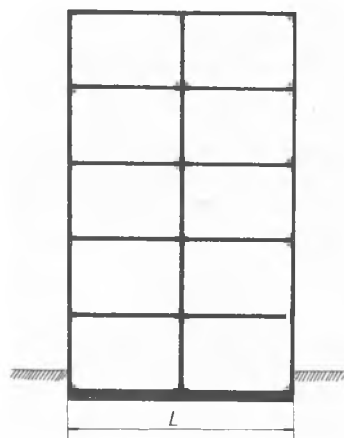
Symmetrical framed structure with three columns on an elastic combined footing
